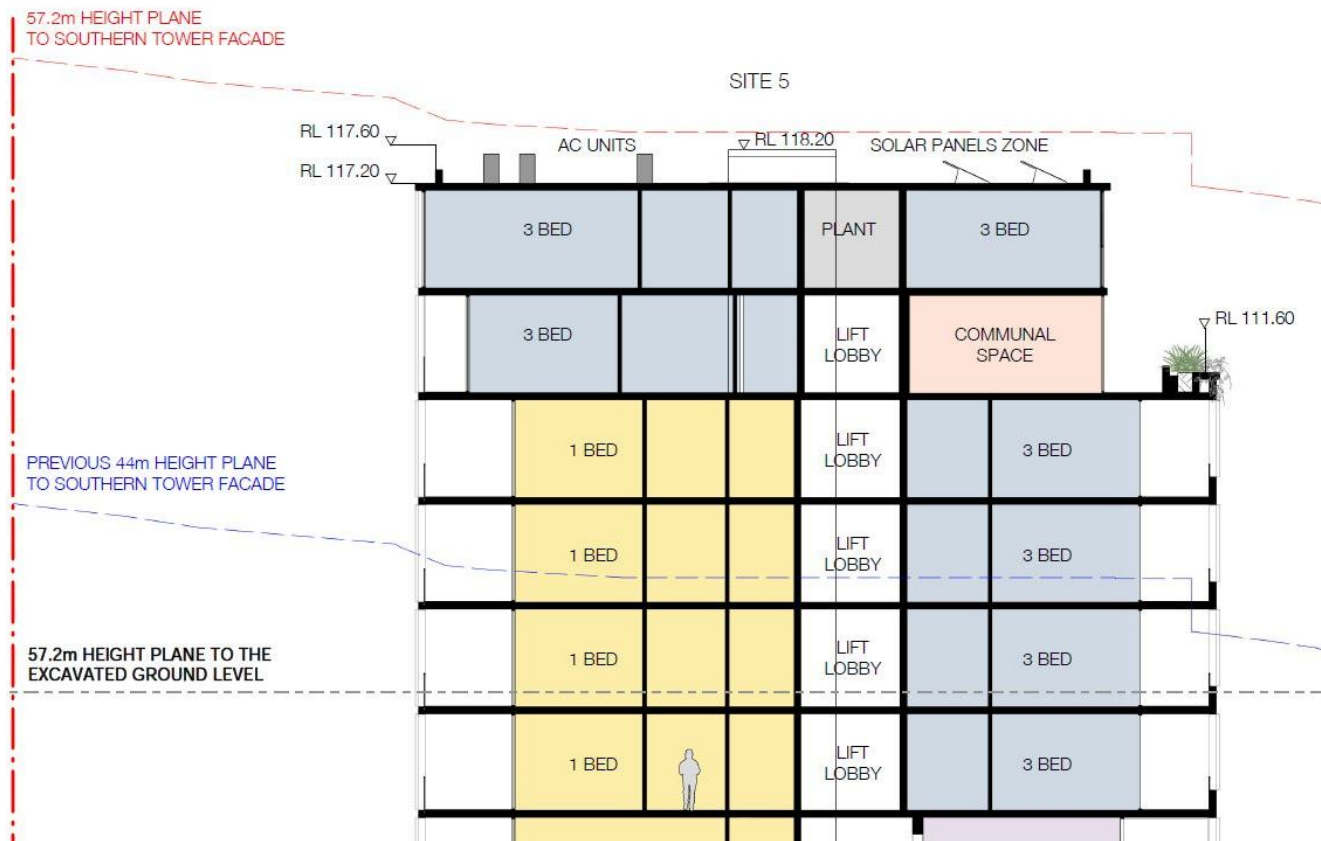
Proposed development when considering the Maximum 57.2m Building Height Plane afforded by the Housing SEPP 30% Bonus. (Source: Architectural Plans)
